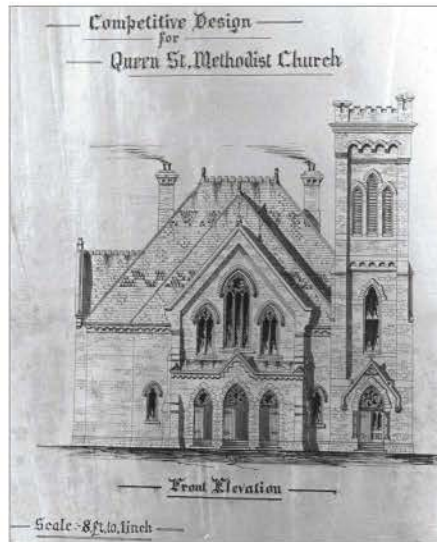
COMPETITION WEST ELEVATION DRAWING OF THE QUEEN STREET METHODIST CHURCH, ARCHITECT JOSEPH POWER, 1886. THIS DESIGN WAS NOT SELECTED. | POWER COLLECTION, LAC.
